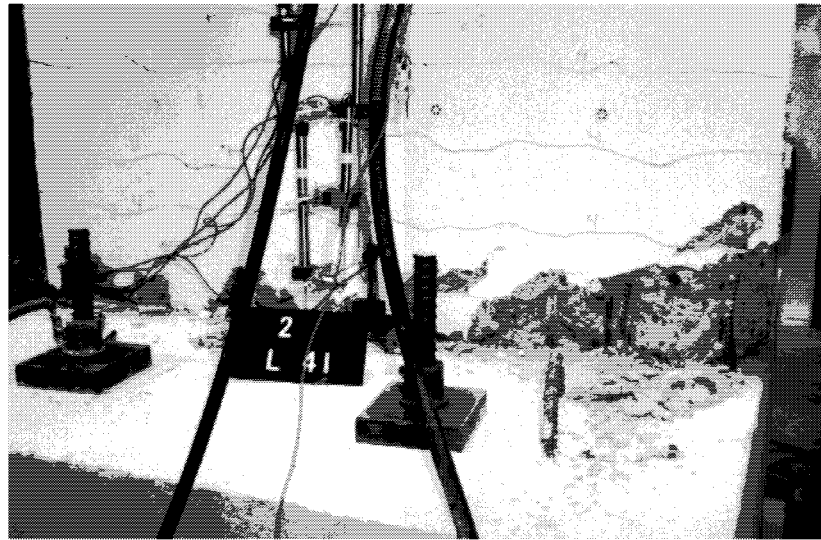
Spalling of Cover Concrete and Buckling in Vertical Bars of Specimen 2
